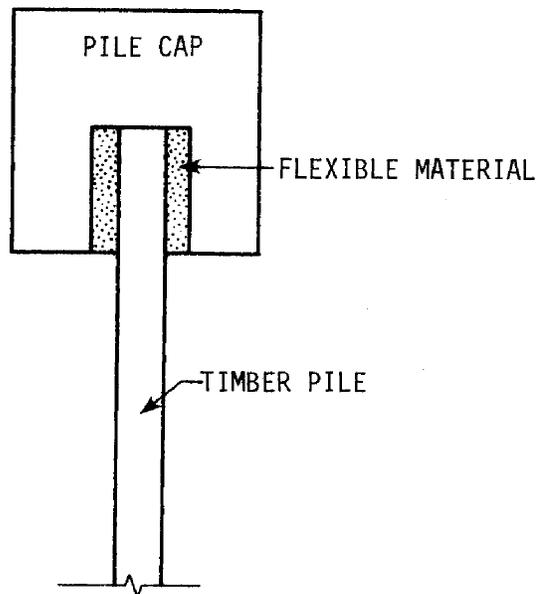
Detail of a timber pile head designed to act as a pinned connection.
